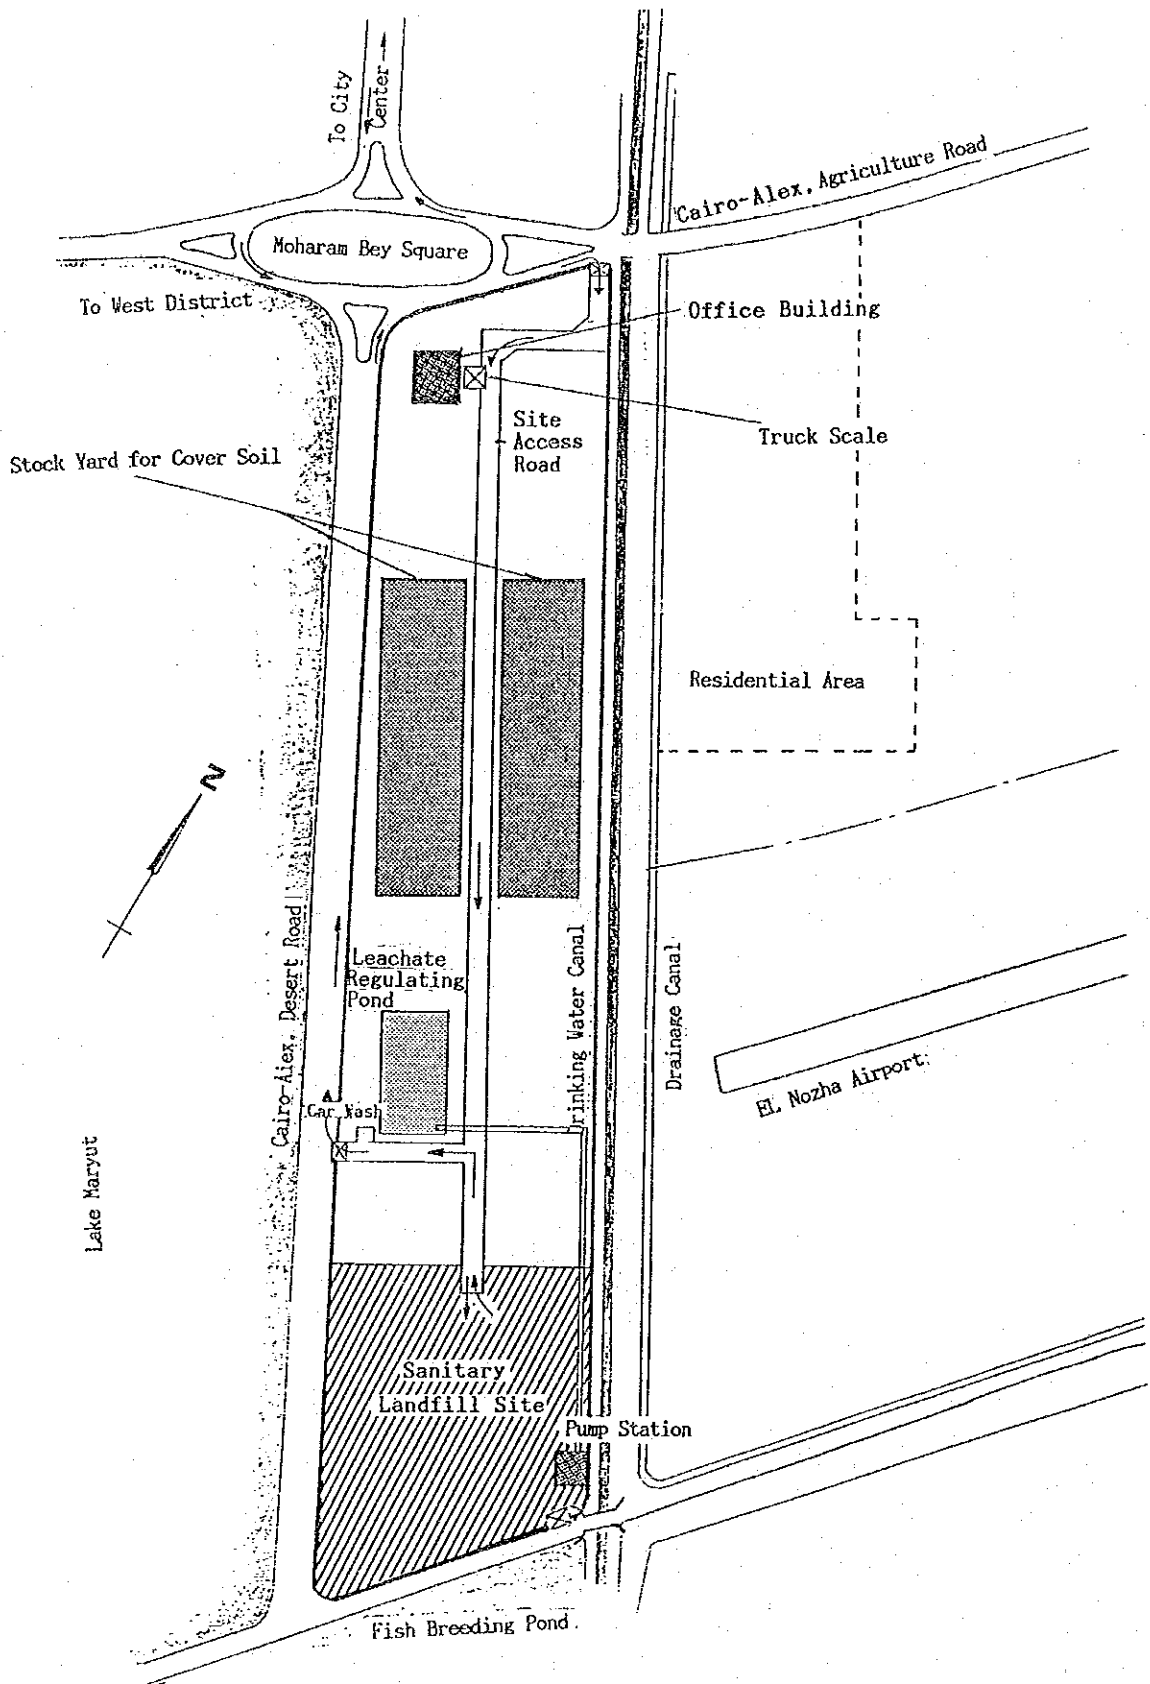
LAYOUT OF THE FACILITIES IN MBSDS
